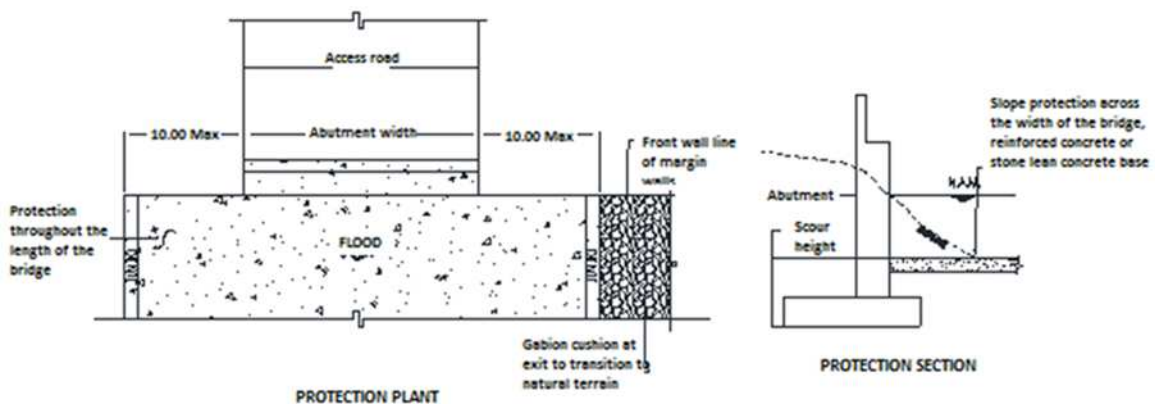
Type of protection at the abutments for the entire width of the riverbed under the bridge. (SPOP, 2014)
